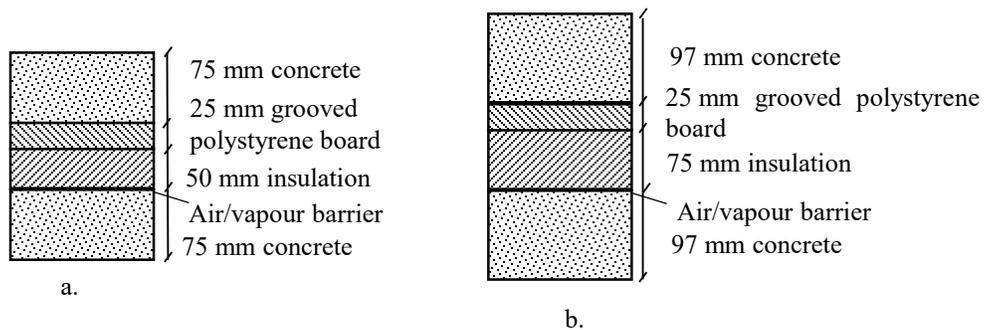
Details of a. P1 and b. P2, PICP specimens with ZSPC tested by Fero Corporation
